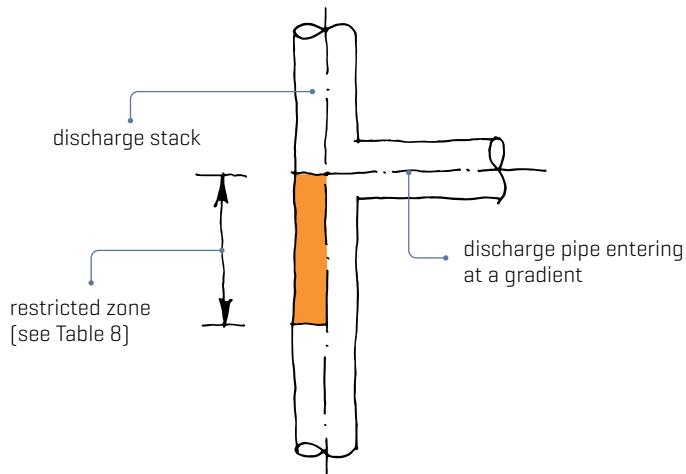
Restricted zone for connections – discharge pipe entering at a gradient.
